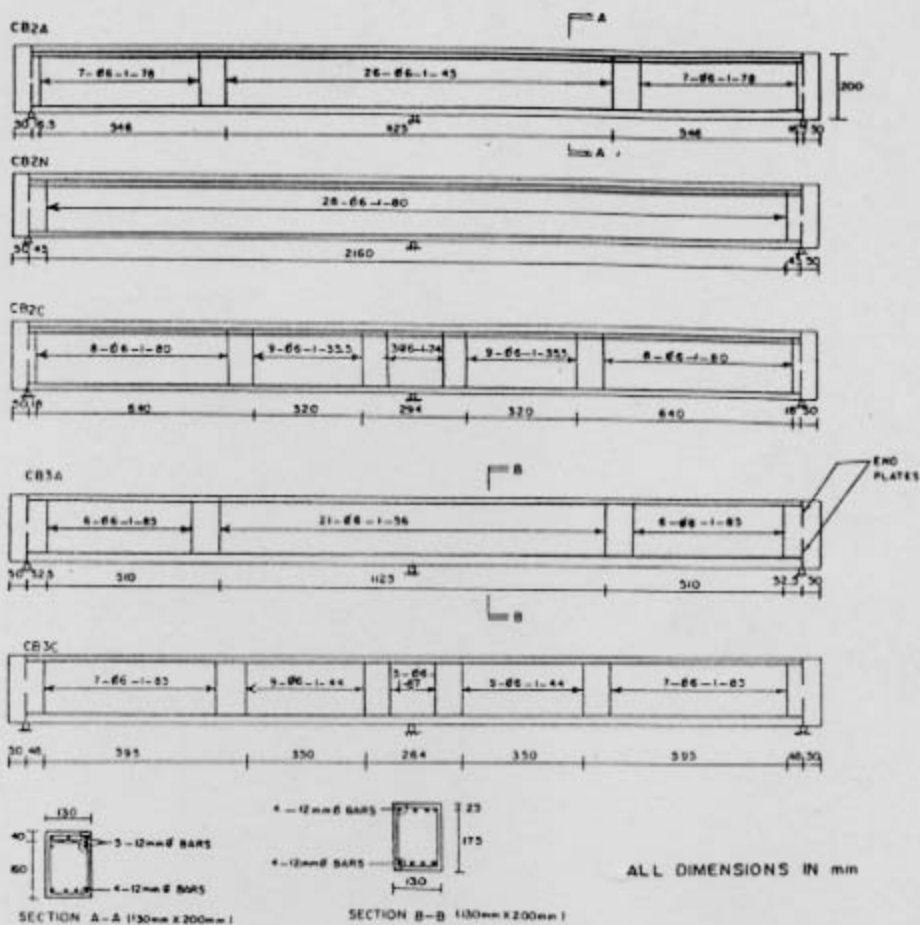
Dimensional, Cross-Sectional and Design Details of RC Continuous Beams Tested
